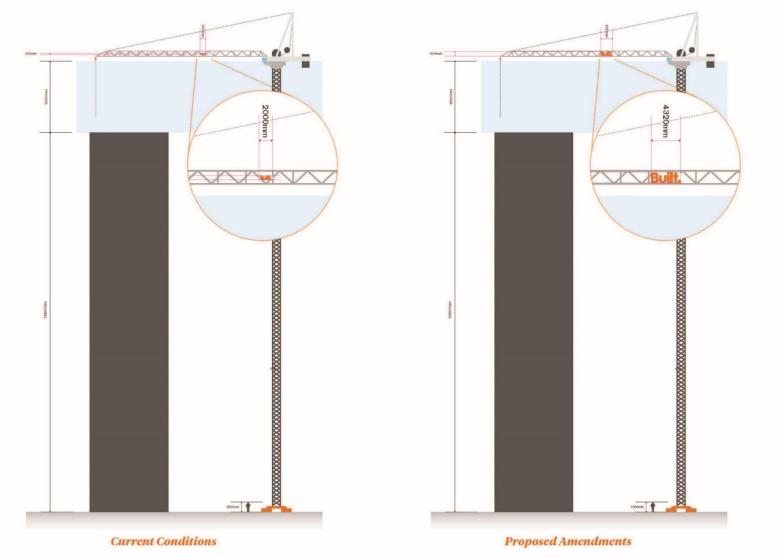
Scale representation of crane signage size for 135m tall building (4 Parramatta Square) under Current Conditions (left) and Proposed Amendments (right)
